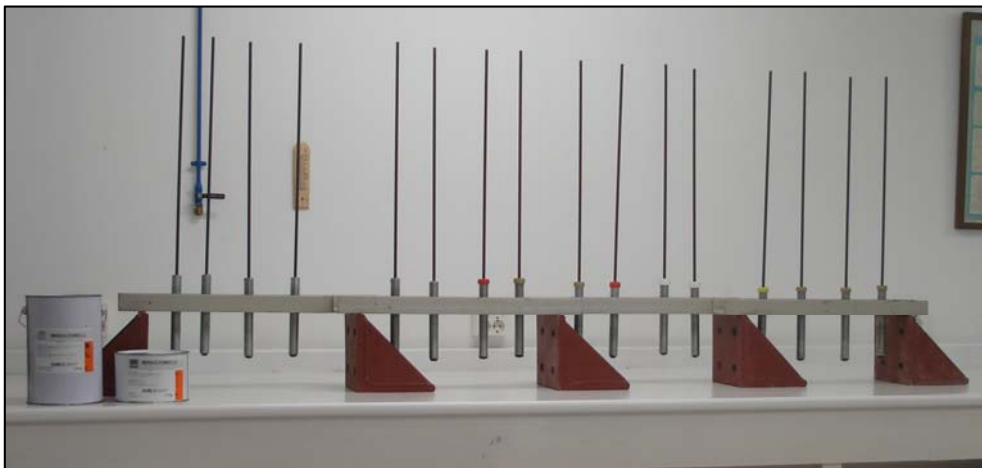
Preparation of the first anchor of straight bond-type anchorages.
